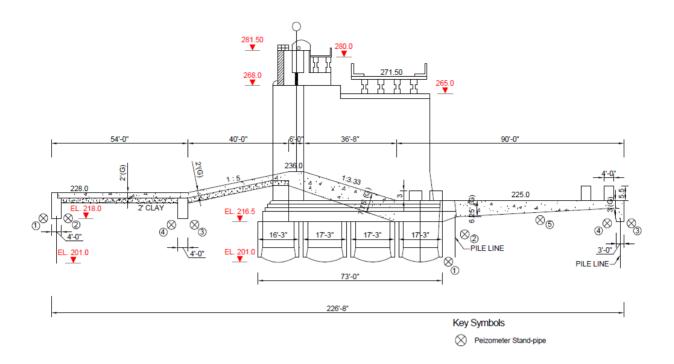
A Typical Gate Bay Section of Guddu Barrage
